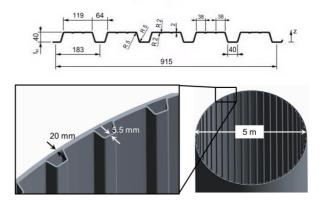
Top: Trapezoidal sheet T40.1 [13]. Bottom: CAD-model trapezoidal tower.
